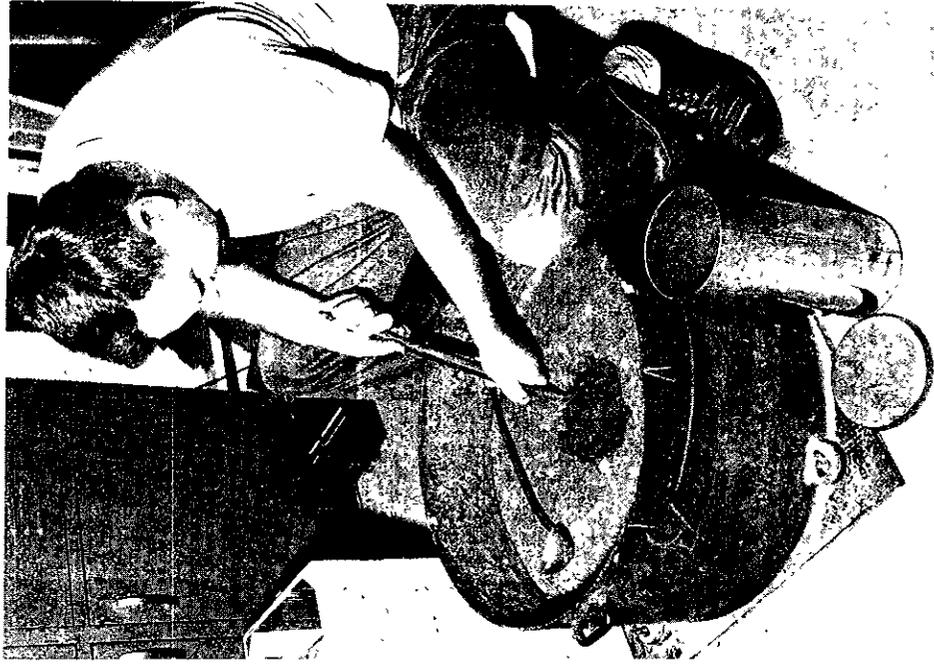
Sand volume test in bottom layer of soil in the mold.
